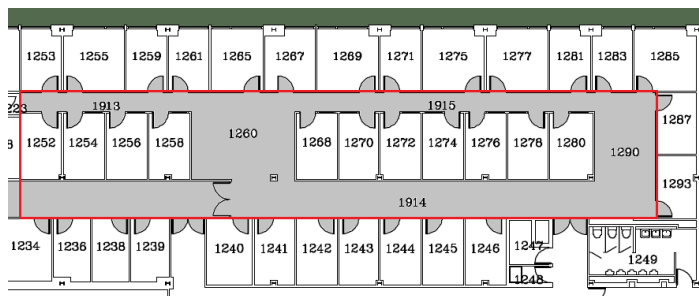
Existing Floor Plan for Office Space – Red Area is Area of Work
